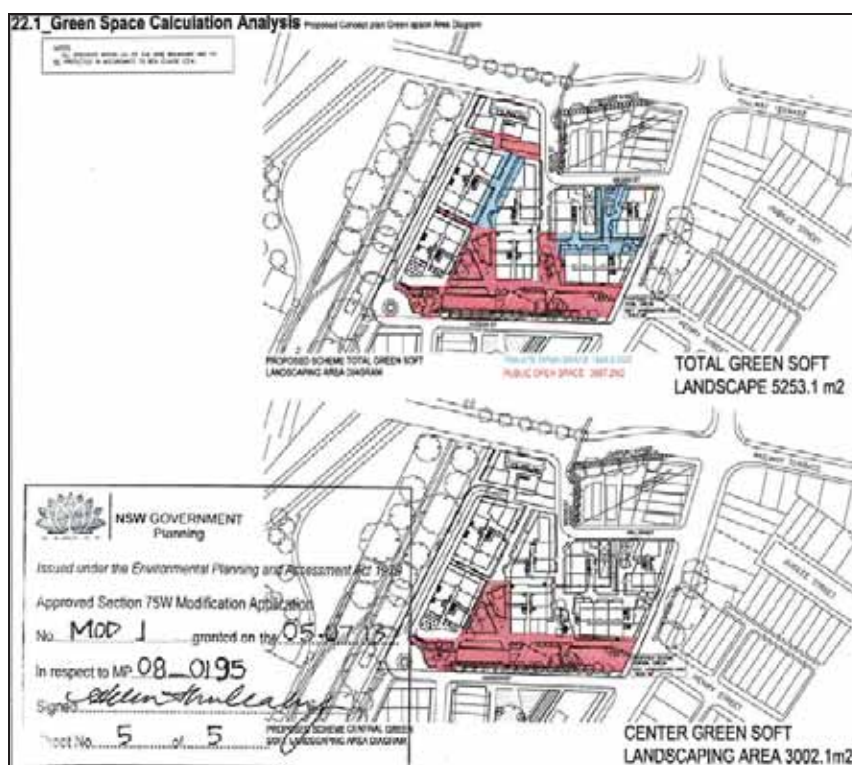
Part 3A Concept Plan approval – Green Space Calculation Plan
